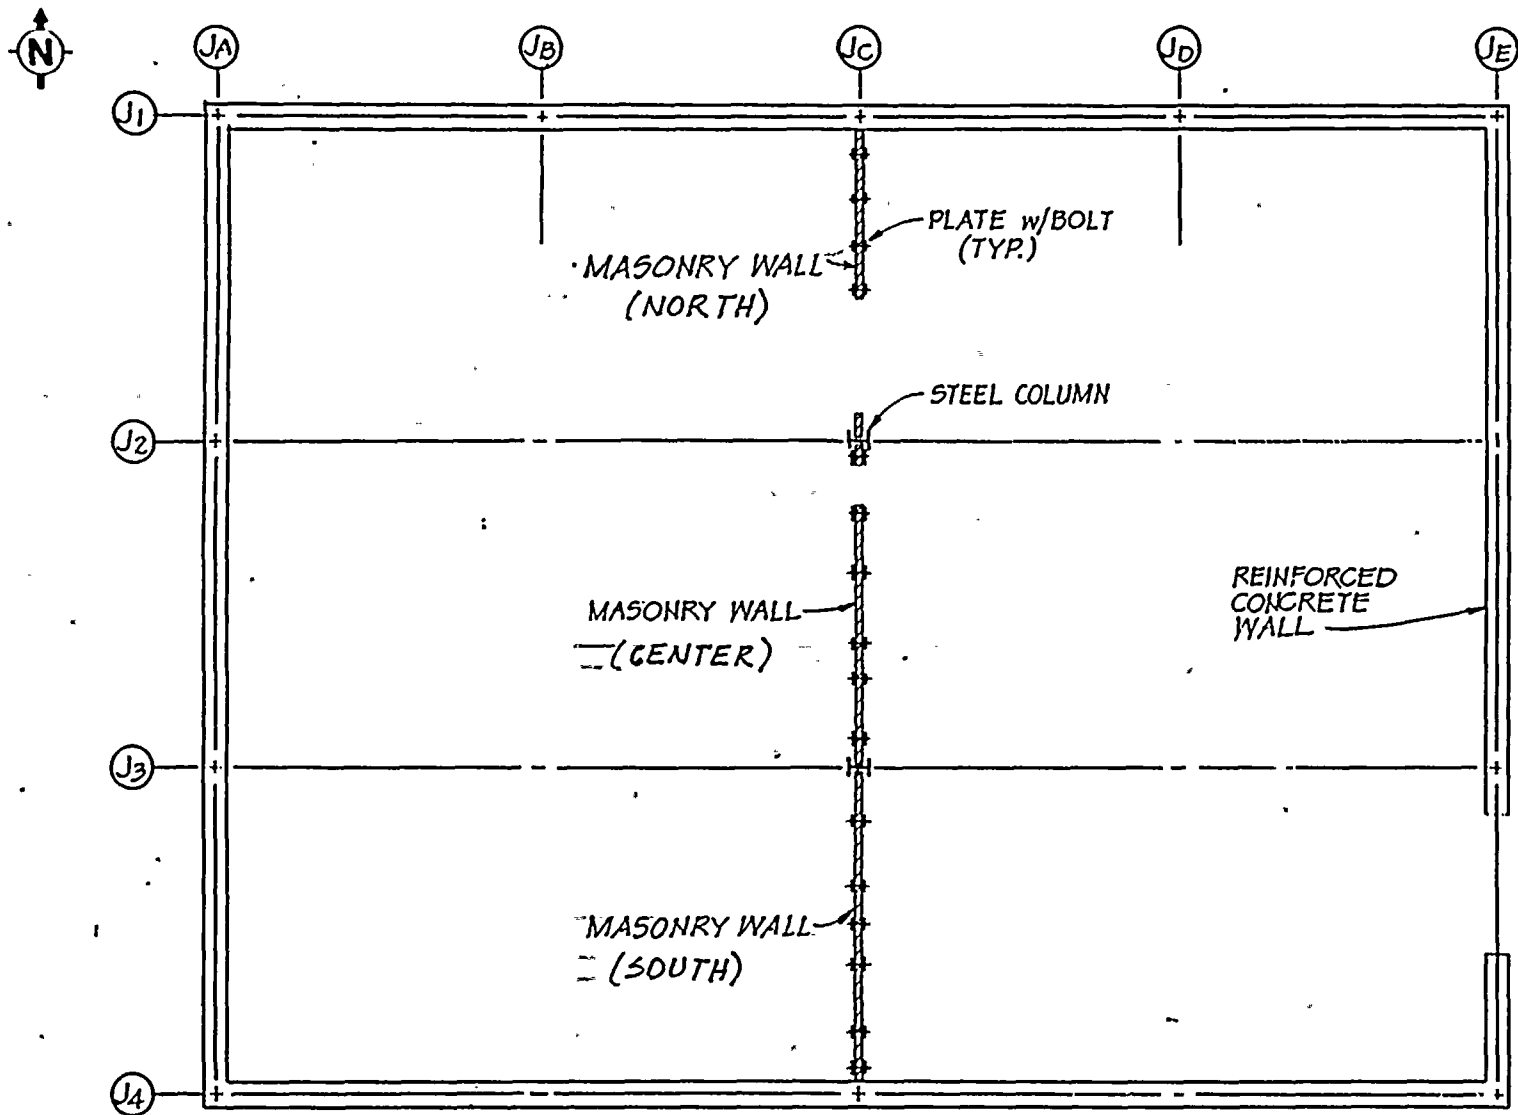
MASONRY WALL MODIFICATIONS - CONTROL BUILDING PLAN ELEV. 74'-0"
